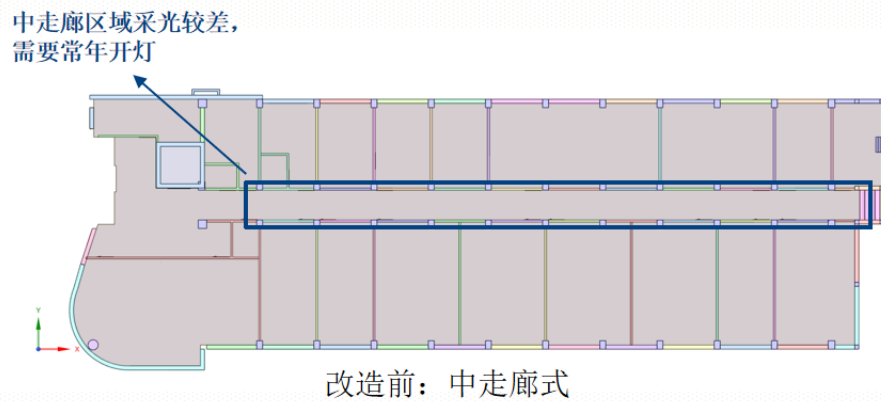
Schematic diagram of the pre-renovation central corridor layout
